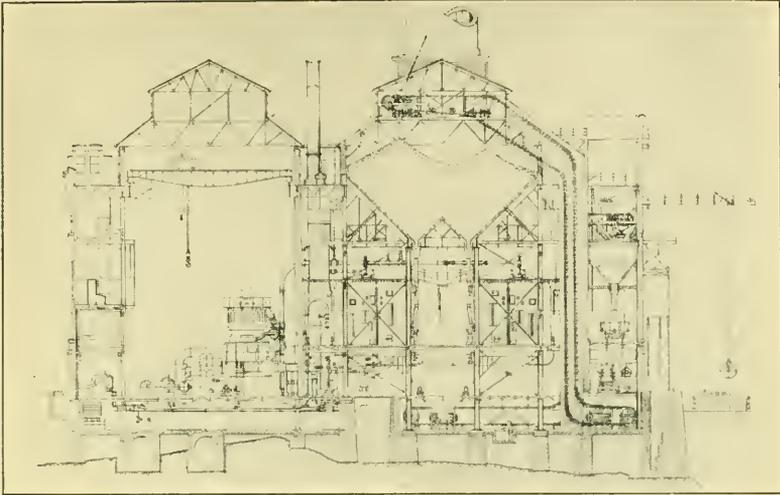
TYPICAL CROSS-SECTION OF THE PORT MORRIS POWER STATION.
